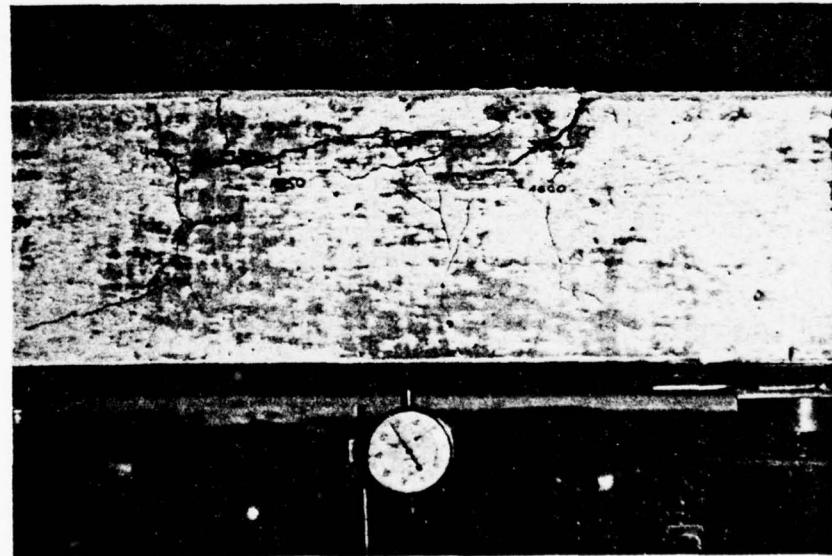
Beam T-4-C. Load = 5.5 kpj. Close Up View of Side Split Failure.
